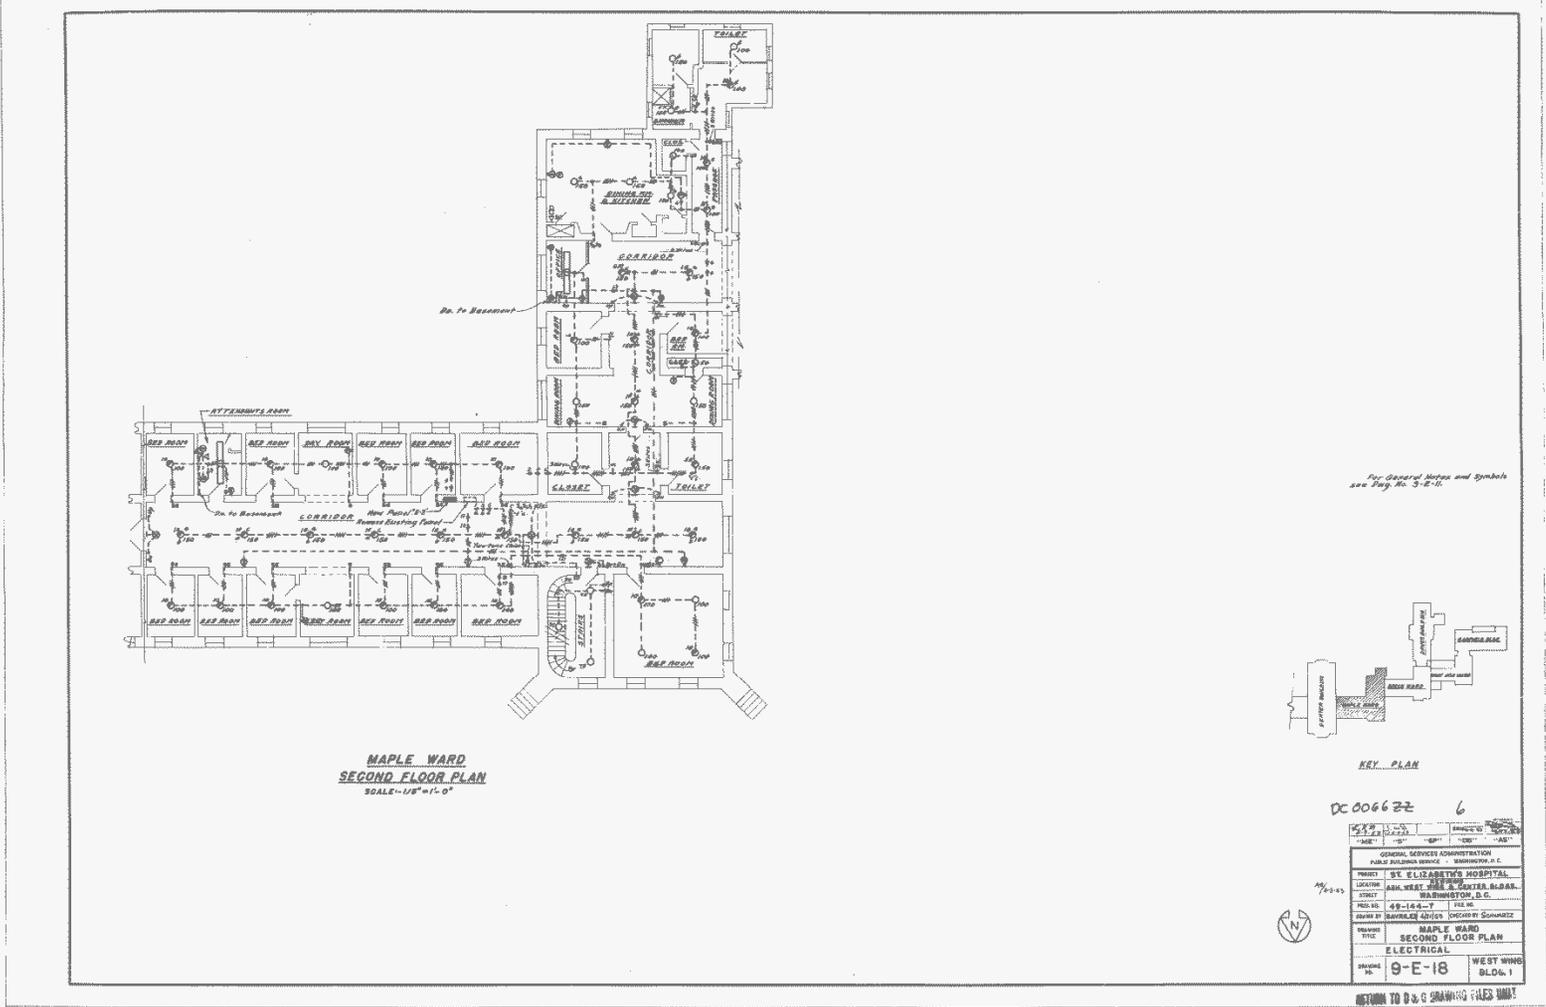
Second floor plan of the west wing of the Center Building, Maple ward, outlining improvements to the electrical system, 1953. Source: GSA archives, image DC0066SE0006.
